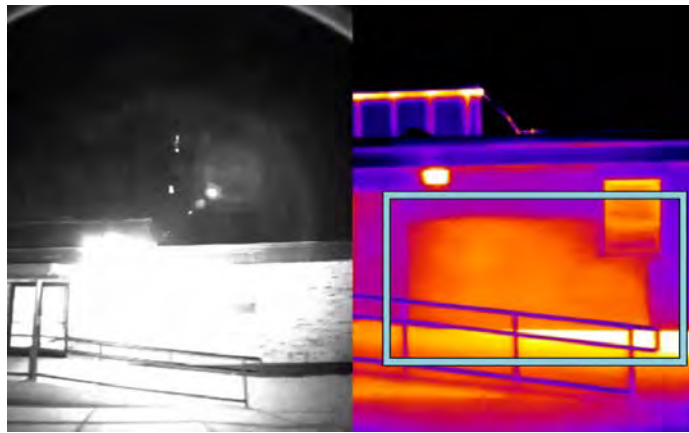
shows another similar patch of poorly insulated wall shows up at timestamp 229:06.
